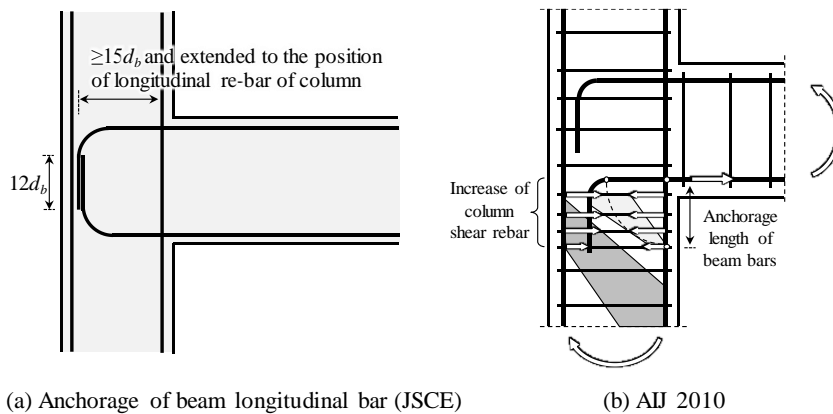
Japanese design codes for beam rebar anchorage (JSCE and AIJ)
